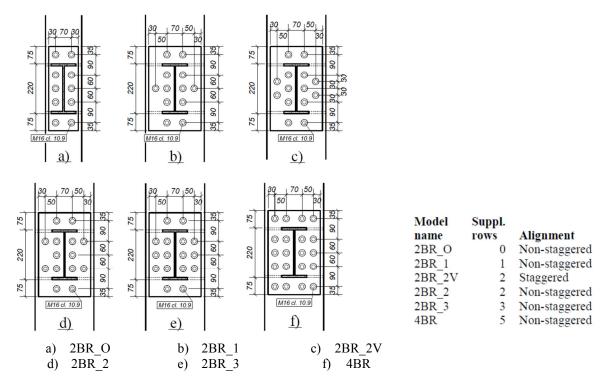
Connection configurations (dimensions in mm) and description of the models considered
